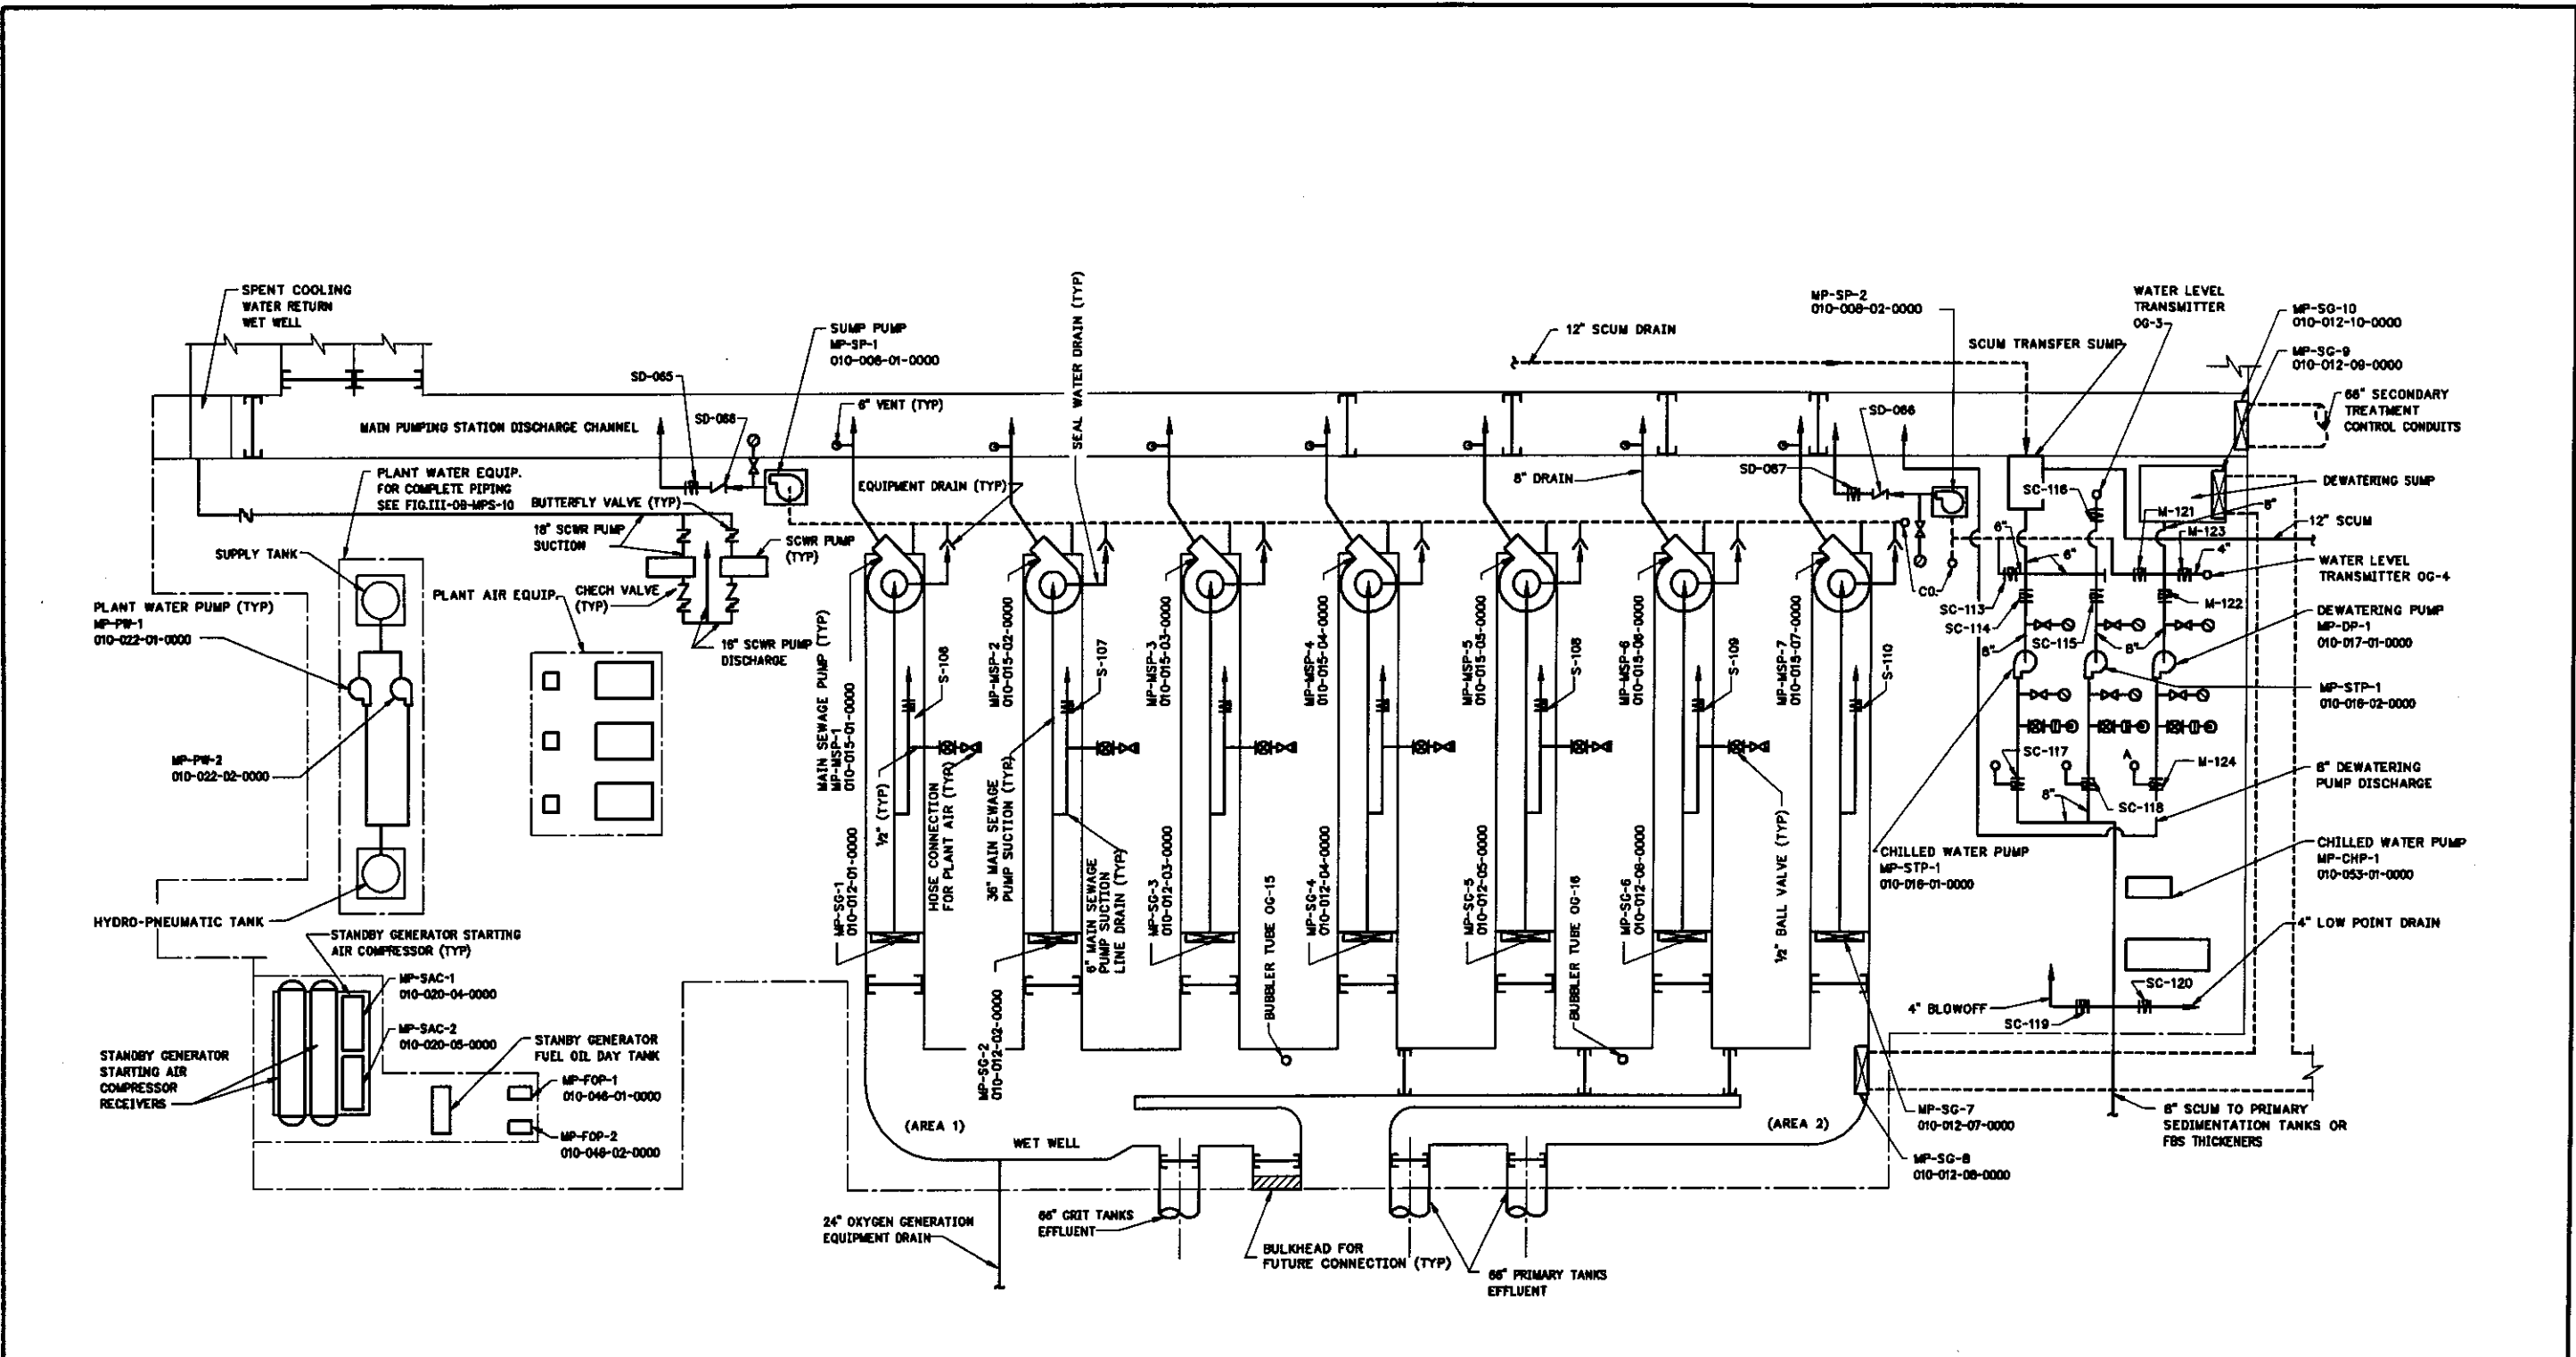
FIGURE III-OB-MPS-1 MAIN PUMPING STATION LOWER FLOOR SCHEMATIC PLAN
